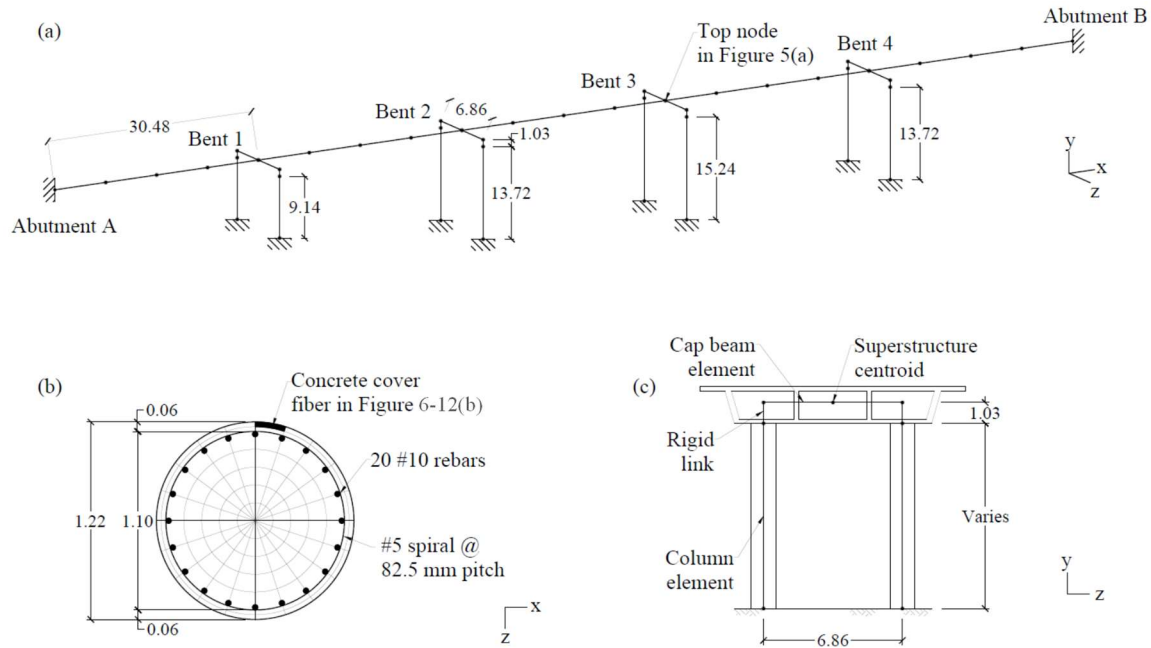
Structural model of the bridge (units in m): (a) finite element model of the bridge; (b) fiber discretization of columns cross-section; (c) finite element model of a bent
